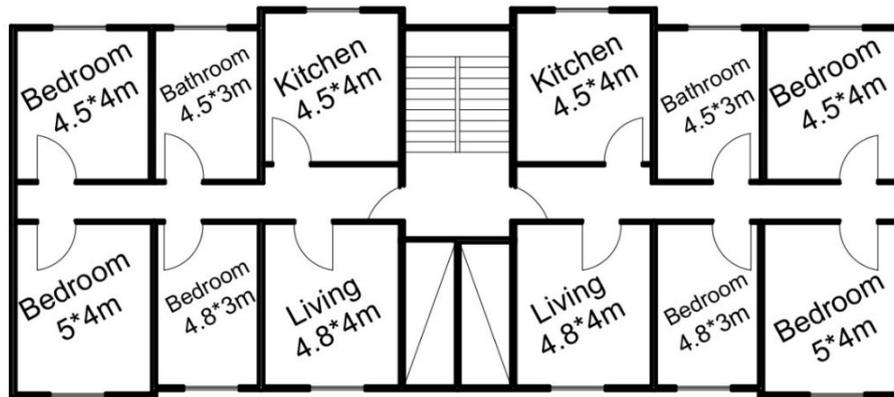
A residential building unit layout (Khalil et al., 2018)
